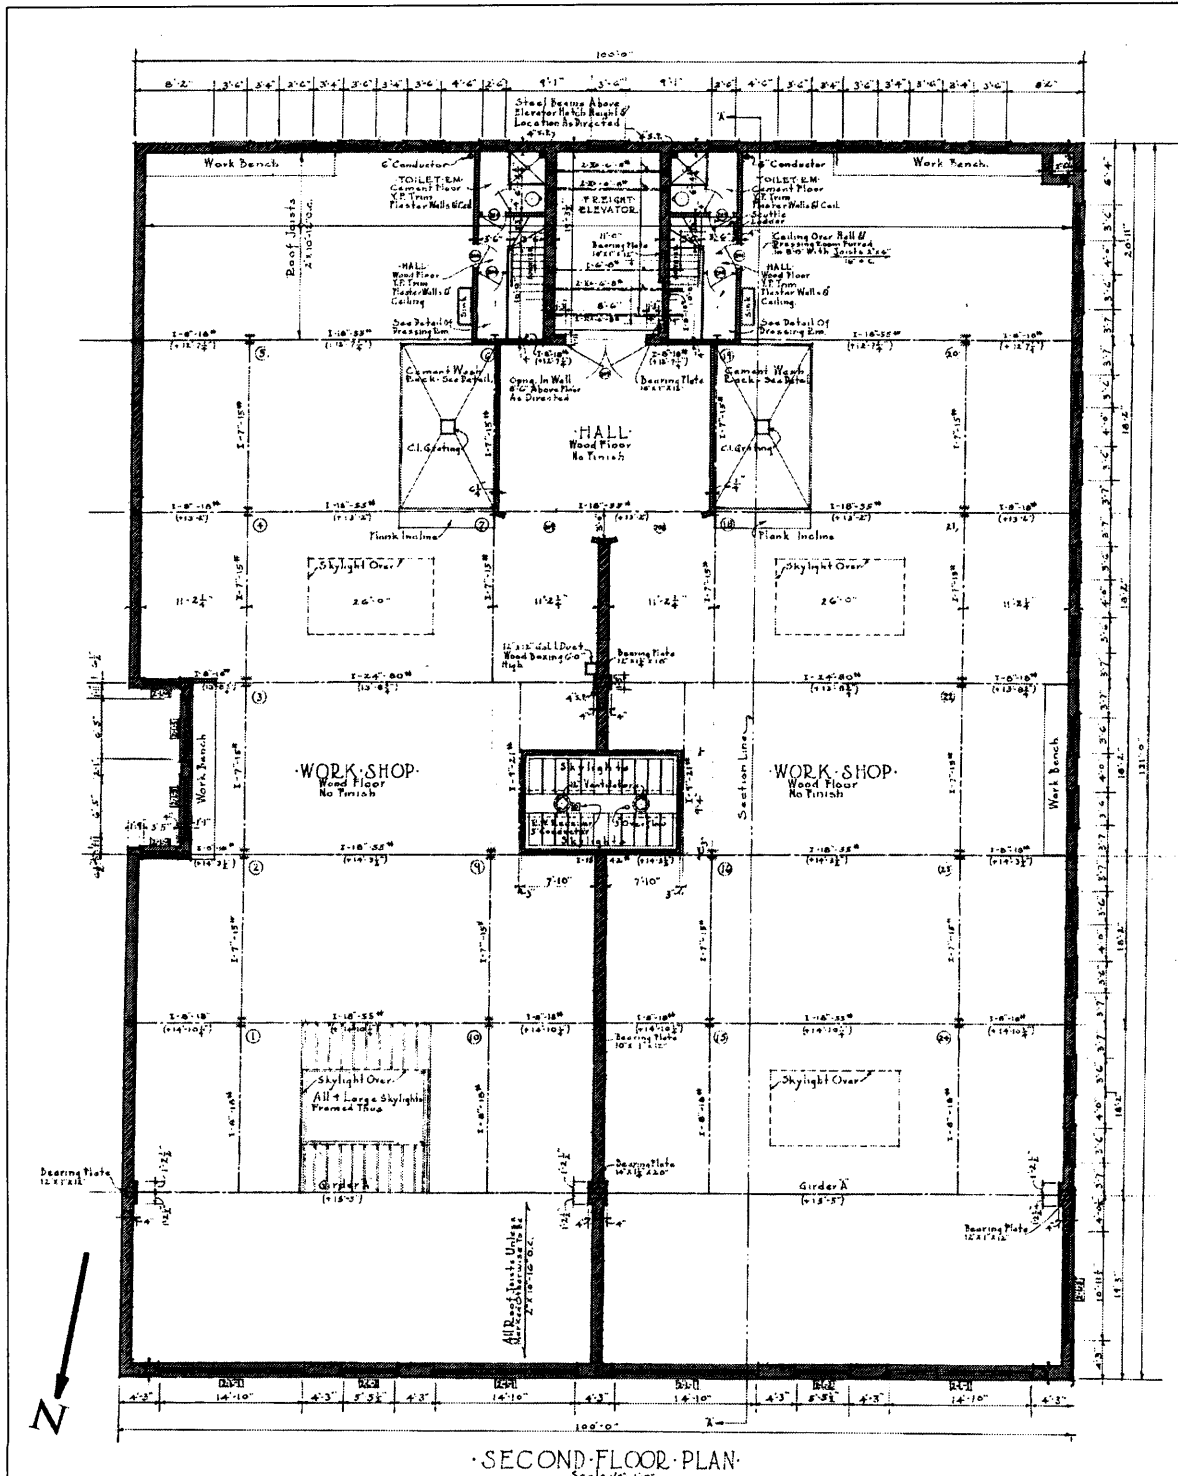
Historic second floor plan (Proudfoot, Bird & Rawson, architects, 1916)
